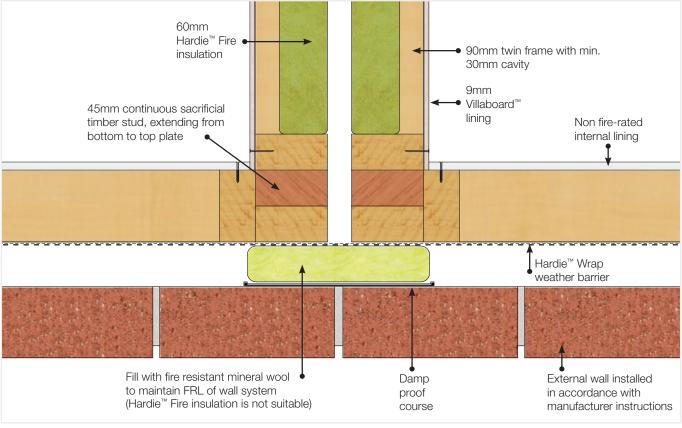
HARDIE™ SMART INTERTENANCY WALL SYSTEM TO NON FIRE-RATED EXTERNAL CLADDING WALL
